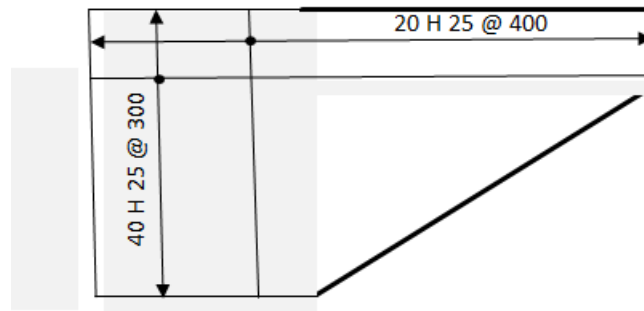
Reinforcement details of the wing wall for the right abutment
